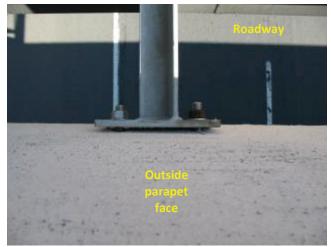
Gap between mounting plate and parapet at sign attachment to parapet
